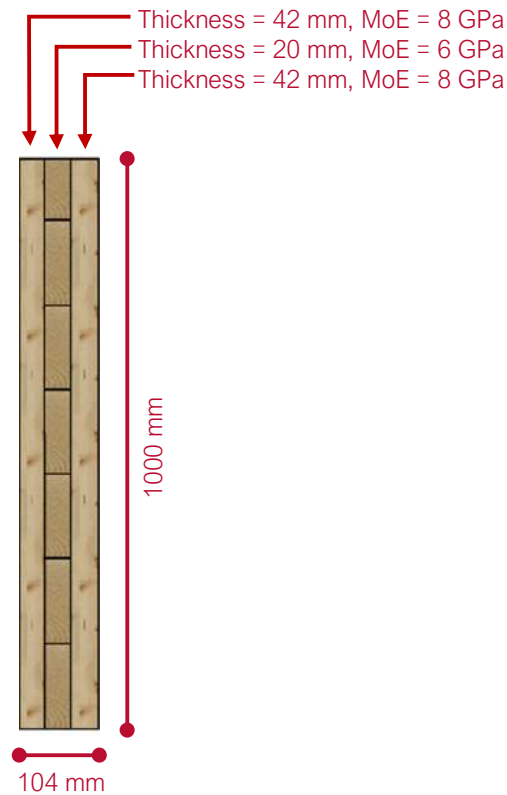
Red Stag CLT Panel Symmetrical Elevation.
